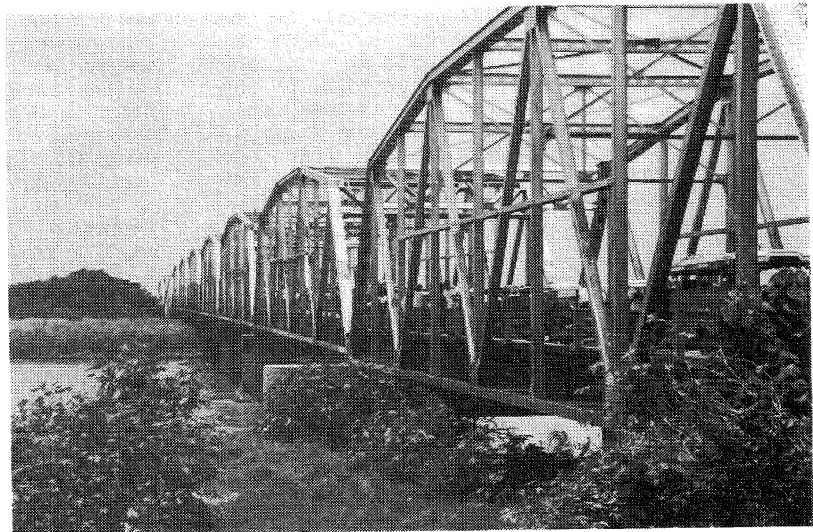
A standard 50 m span rivetted steel truss bridge with concrete deck - Carmen Bridge
